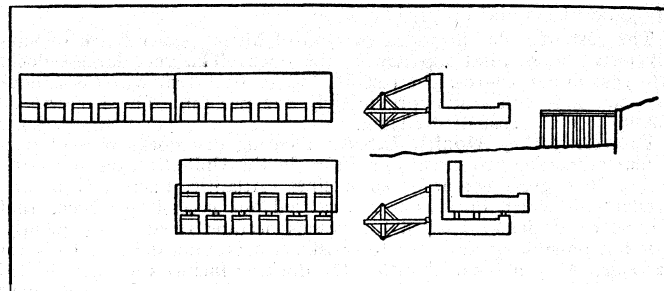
DEPOSITING DOCK OR "SECTIONAL BOX," THE STRONGEST TYPE OF DOCK. ABLE TO WITHSTAND GREAT FORCE AND STRAIN BY MEANS OF THE BOLTED AND RIVETED JOINTS WHICH JOIN THE SECTIONS
